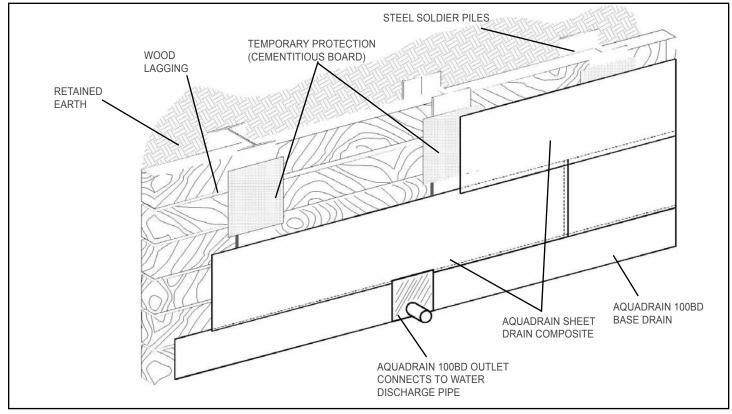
AQUADRAIN SHEET DRAINAGE INSTALLED ONTO SHORING WALL PRIOR TO VOLTEX DS
